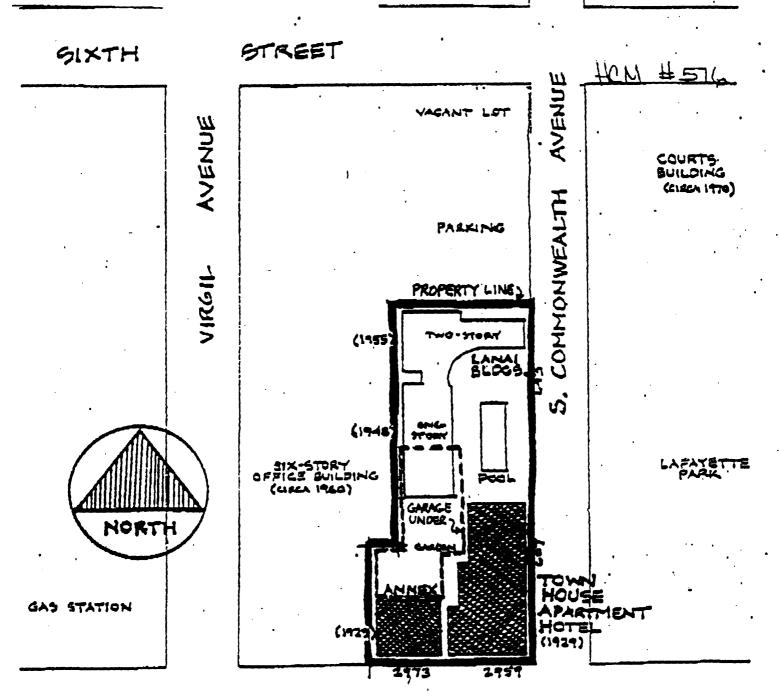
Building Contiguity Above and Below Ground Original from Town House Plans
